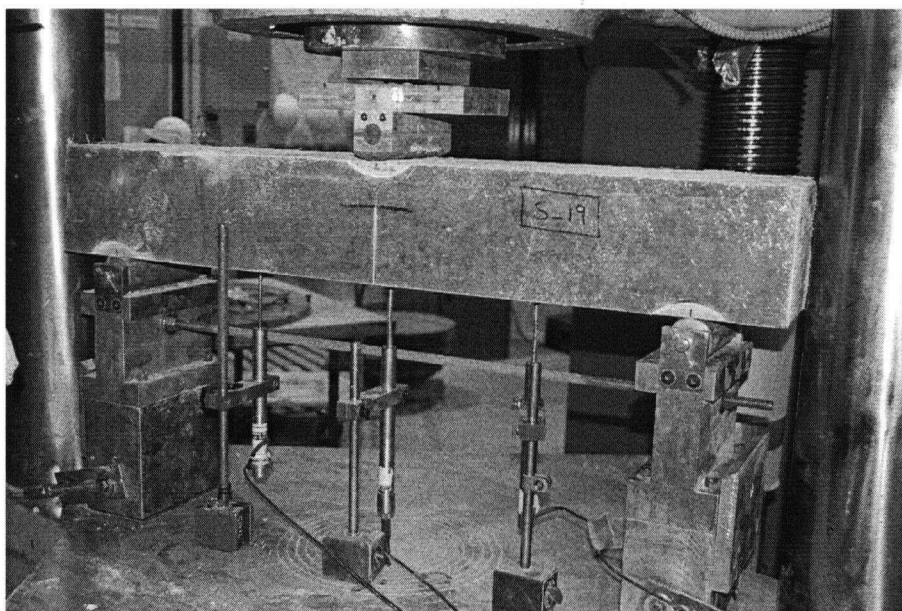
Beam Test Setup under Quasi-Static Loading
